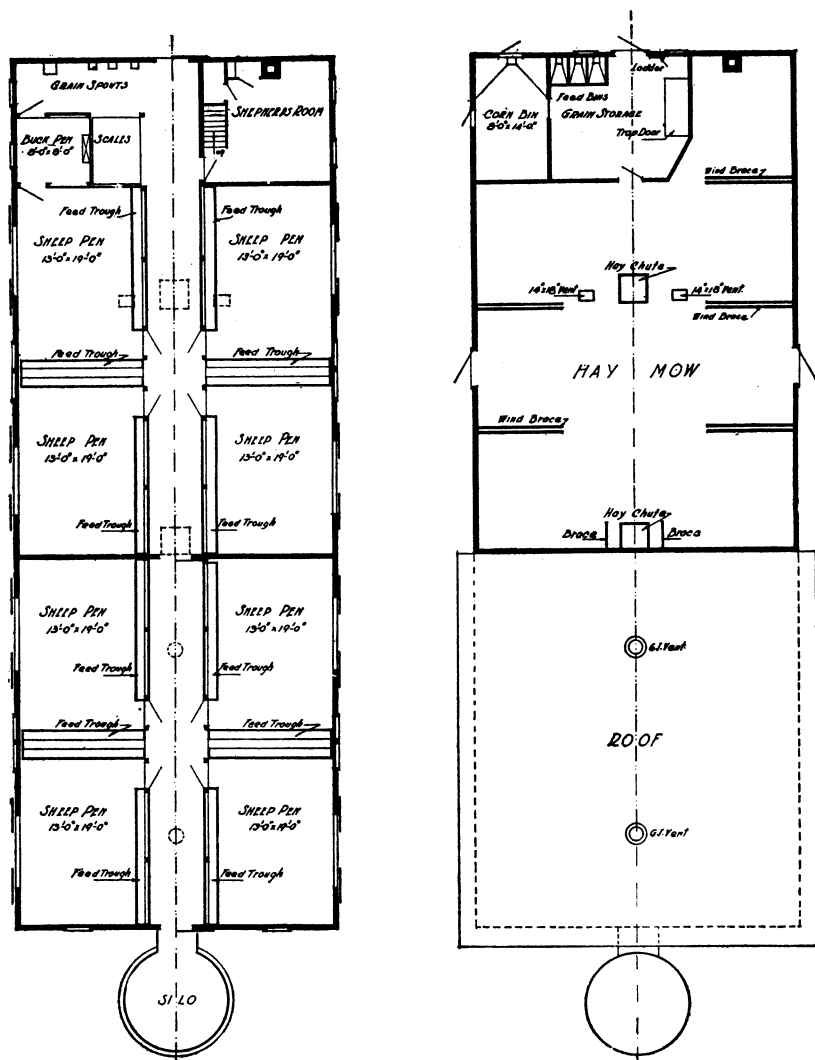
First- and second-floor plans of barn shown in Figure 1.
